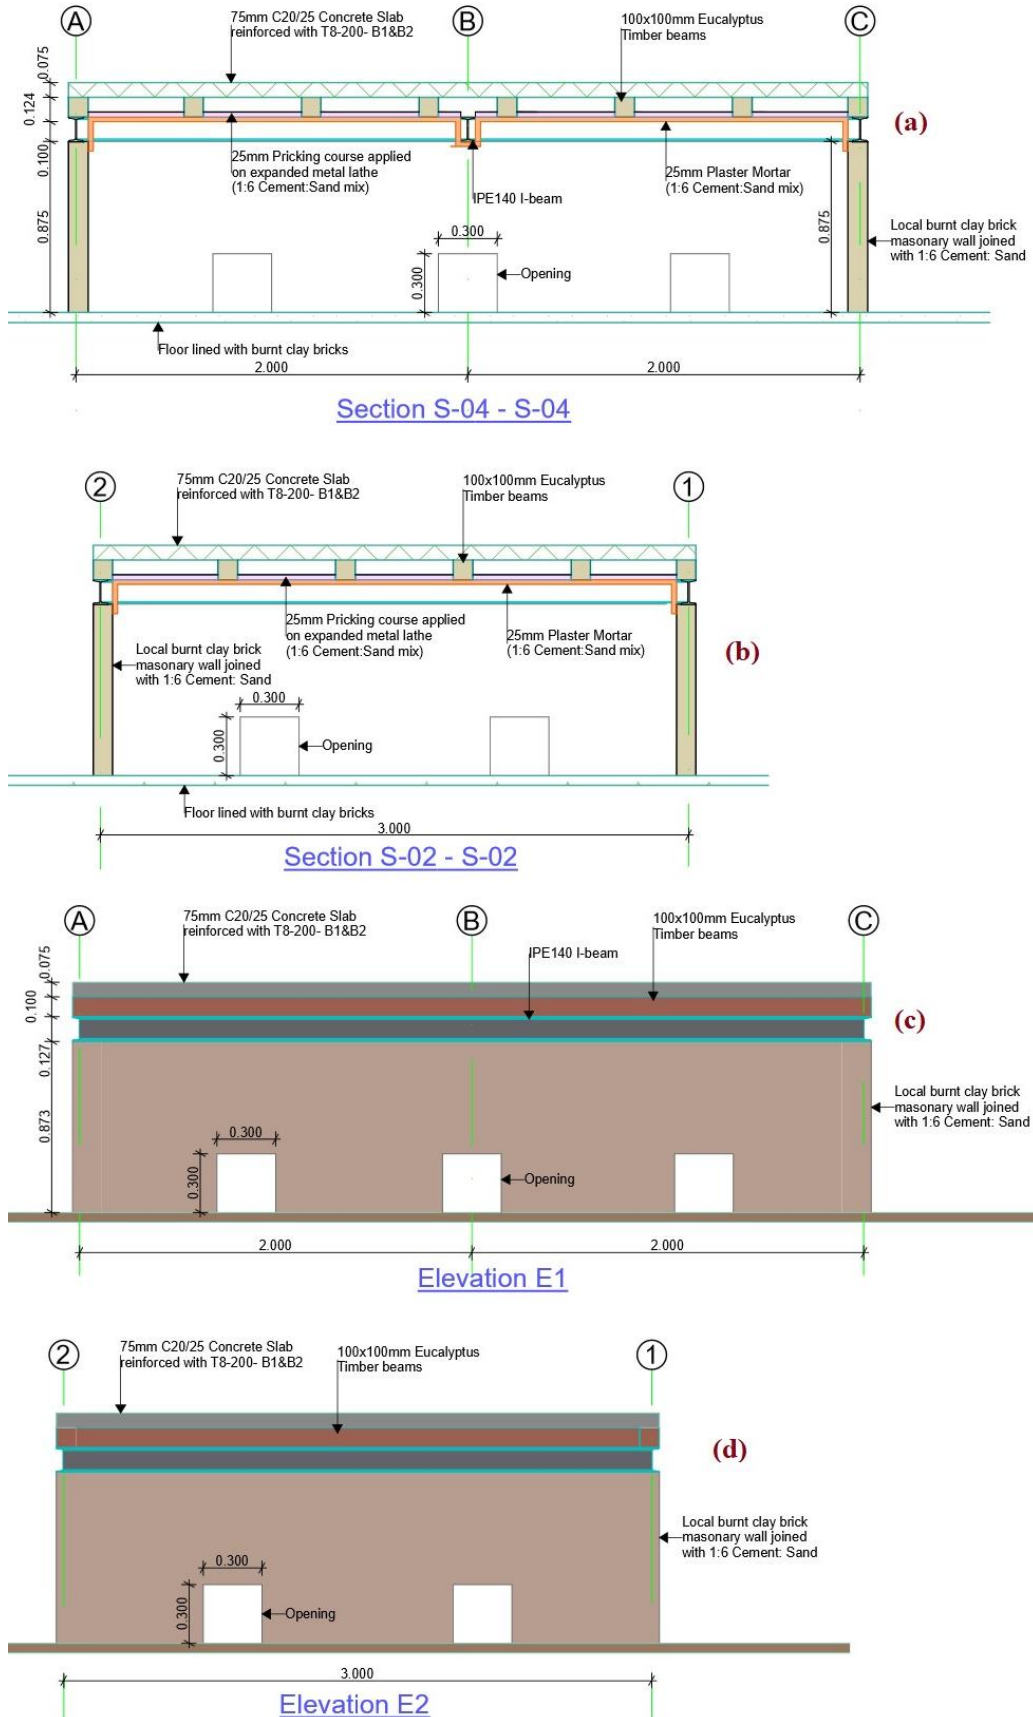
Hybrid (steel timber concrete) slab model setup, (a) Section s-04 - s-04, (b) Section S-02 - S-02, (c) Elevation E1, (d) Elevation E2
